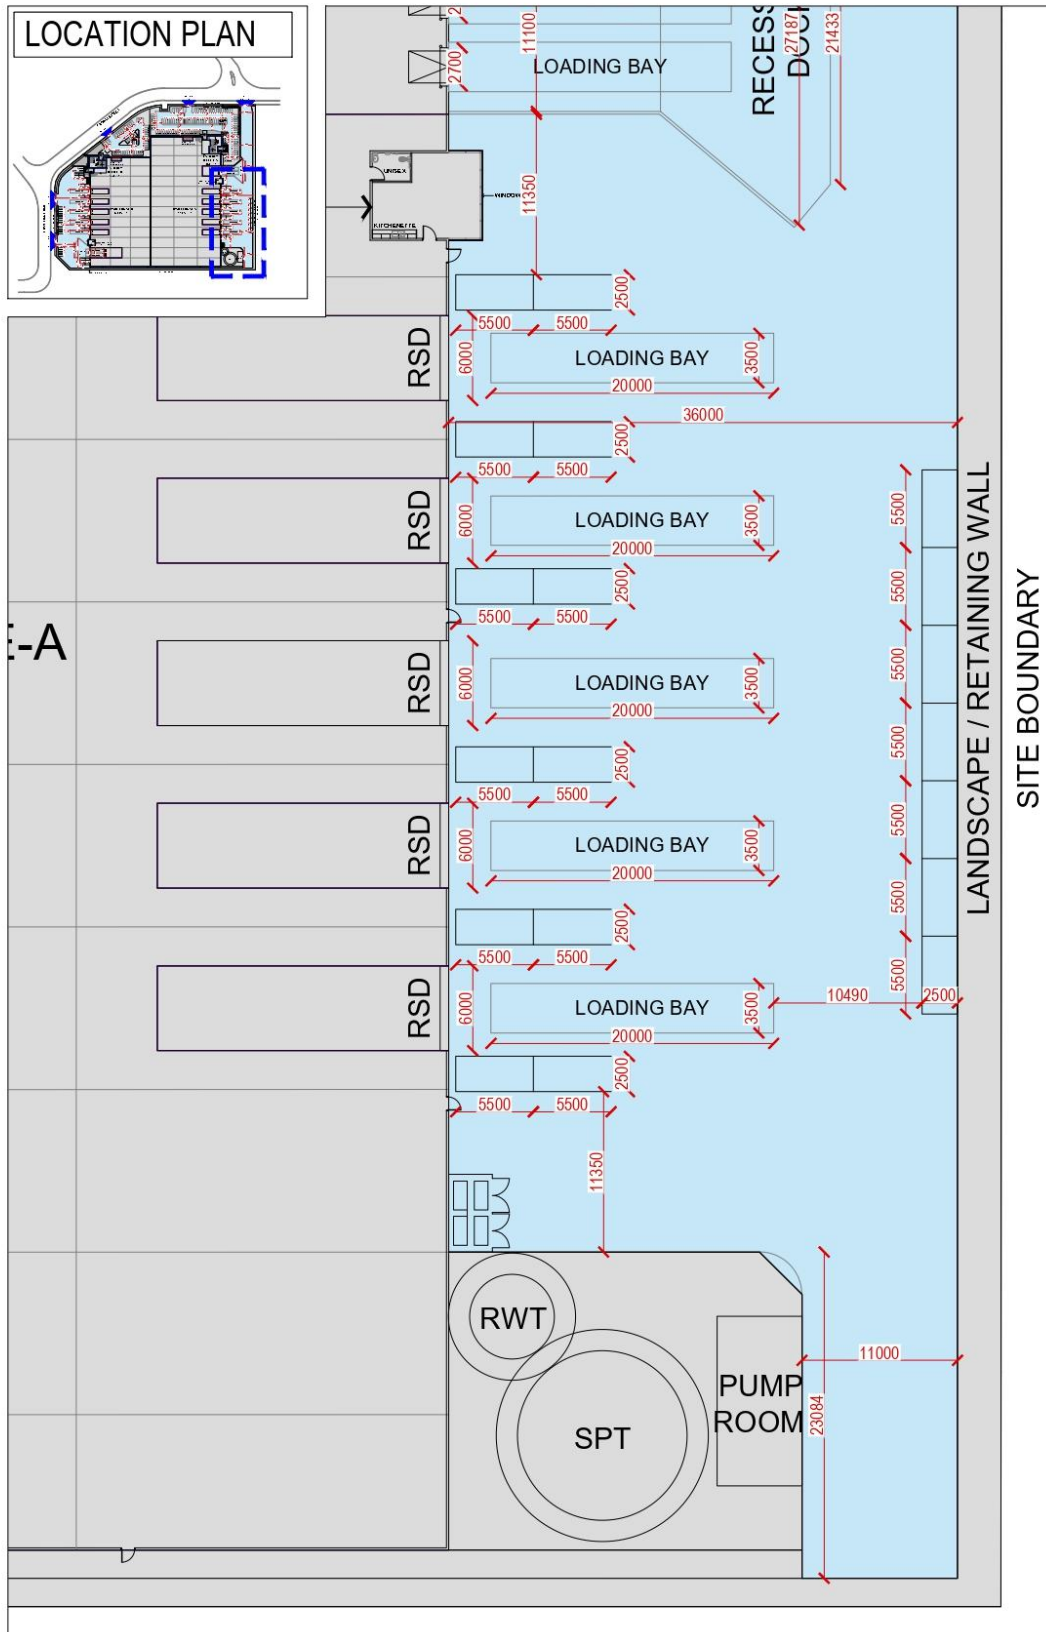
PROPOSED DIMENSIONS OF LOADING AREA
